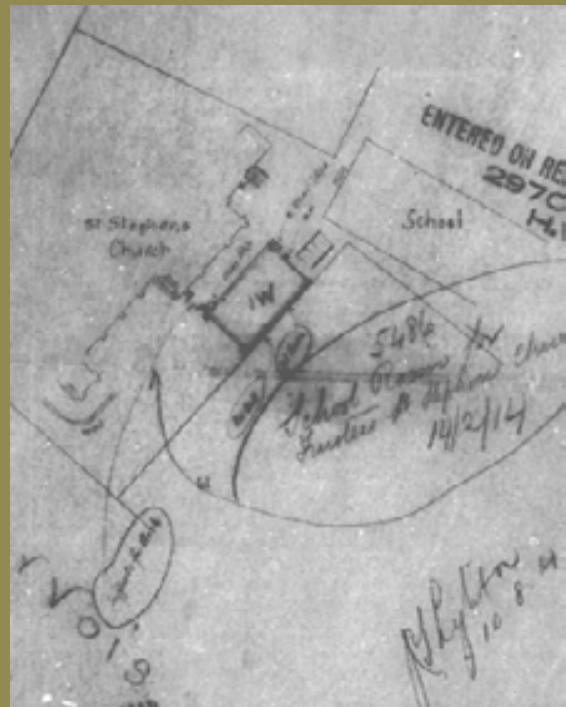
Site plan 1914, showing the corner site on Shelley Beach Road and Jervois Road with the classrooms to be built adjacent to the church 1W. The building called "School" is the hall which was built in 1908. The 1914 classrooms were extended in 1920 to a plan by the architect W Holman. Source: Auckland City Council Archives, 73-73 Jervois Road PN 5486, sheet 2 of 3.
